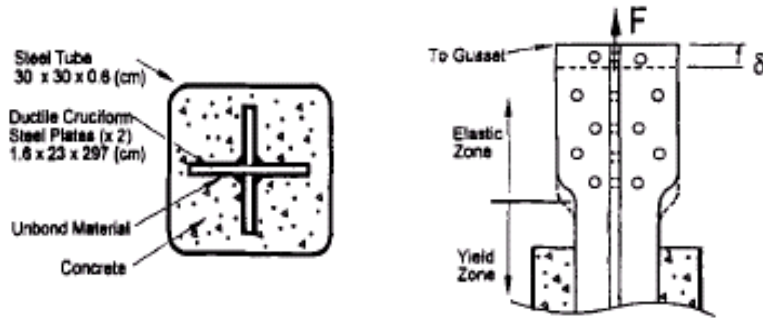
Unbounded brace: cross section (left) and end detail (right).
